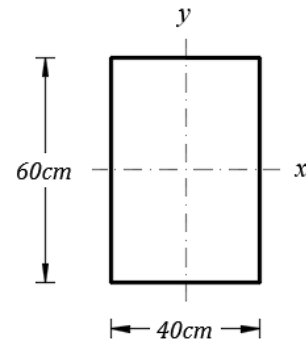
System & Geometry of Column (C20) - Basement (-1) Floor
